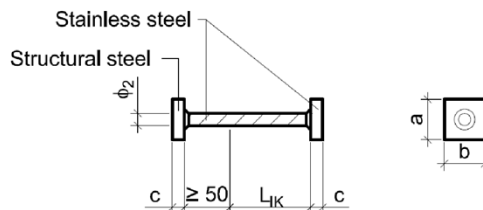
Steel compression element with welded-on compression plates, flush on one side, embedding at least 50 mm on one side (e.g. for Schöck Isokorb® Type K-ID, Schöck Isokorb® RT Type K)
